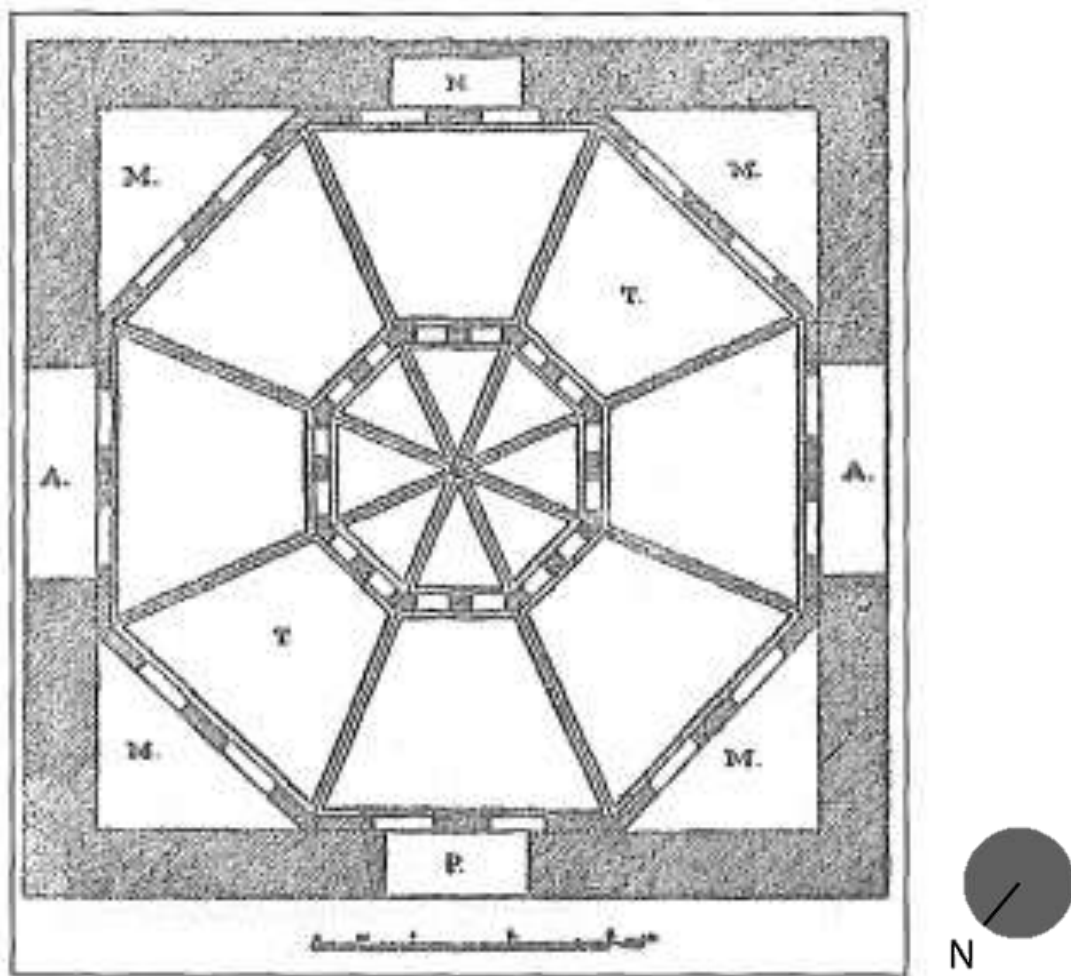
Prayer hall – Madrasa al-Yusufia Plan
